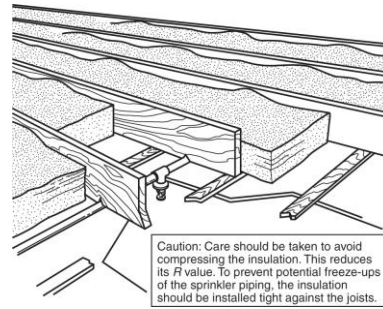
(d) Insulation Recommendations – Arrangement 4.
